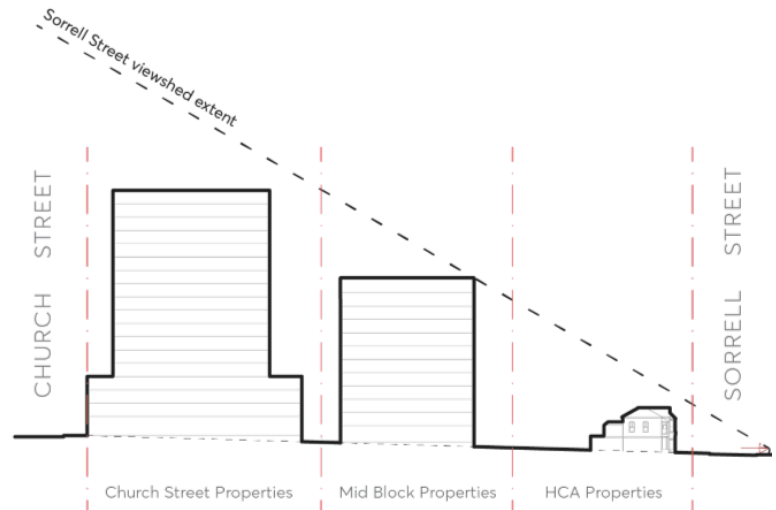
Viewsshed approach from Church Street North rezoning applied to subject site (Source: Principles from Hassell Urban Design Report for Church Street North Rezoning p.61-62)
